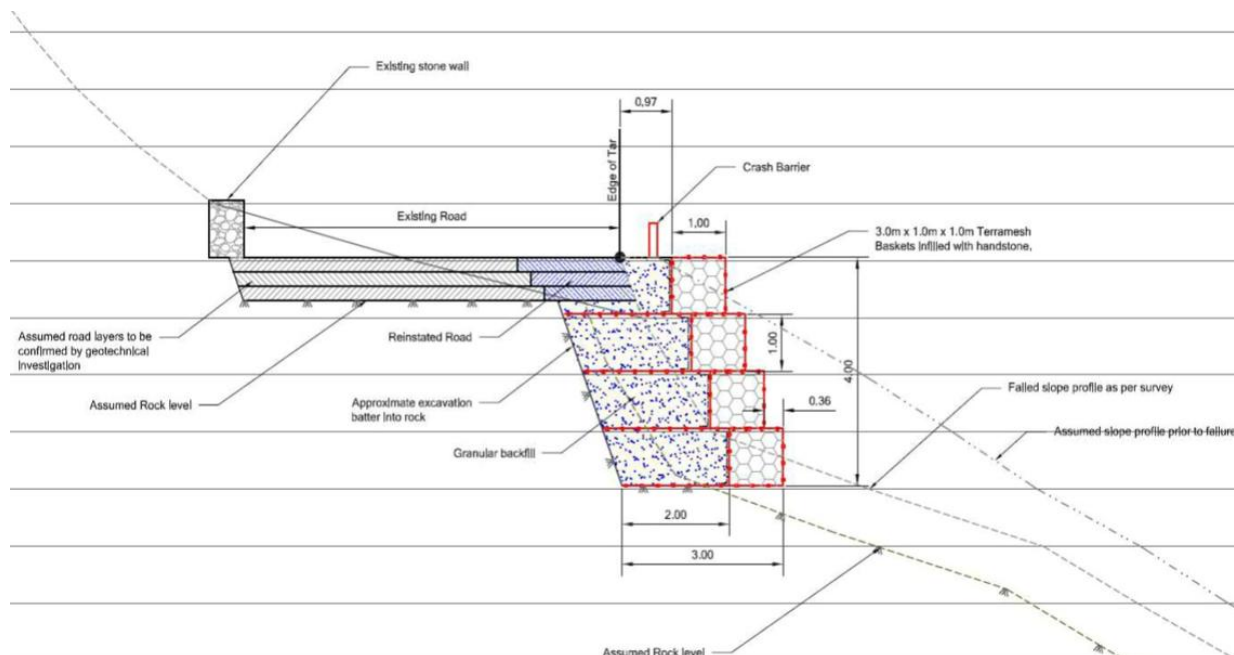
Terramesh retaining wall concept (Ingerop, 2024)
